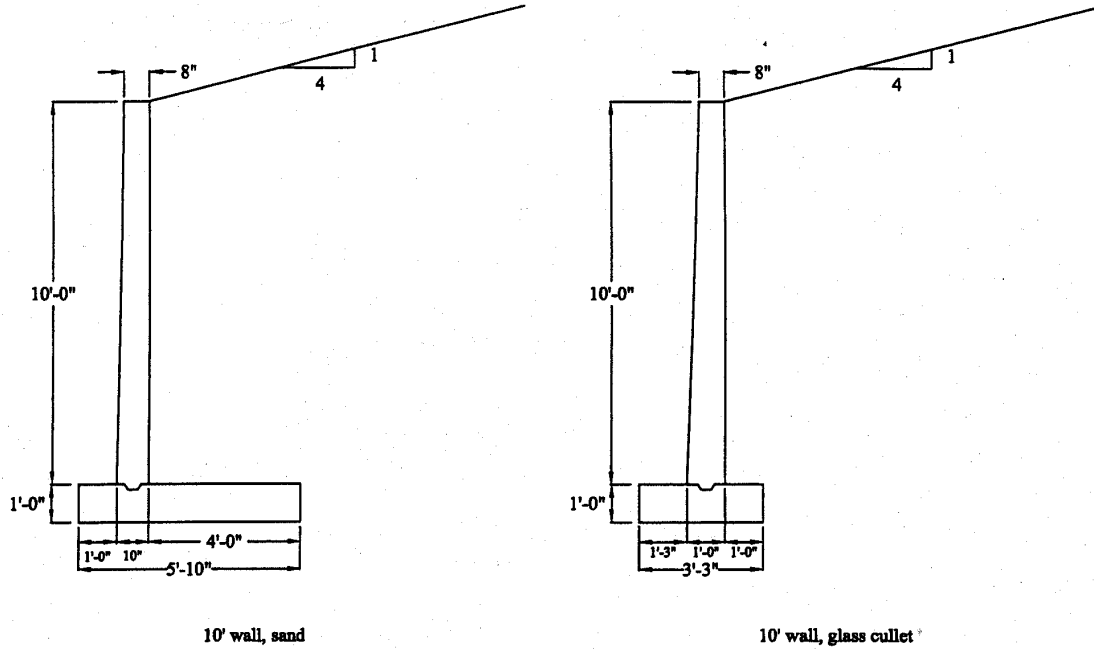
Geotechnical design of retaining walls with glass cullet and sand as backfill material
